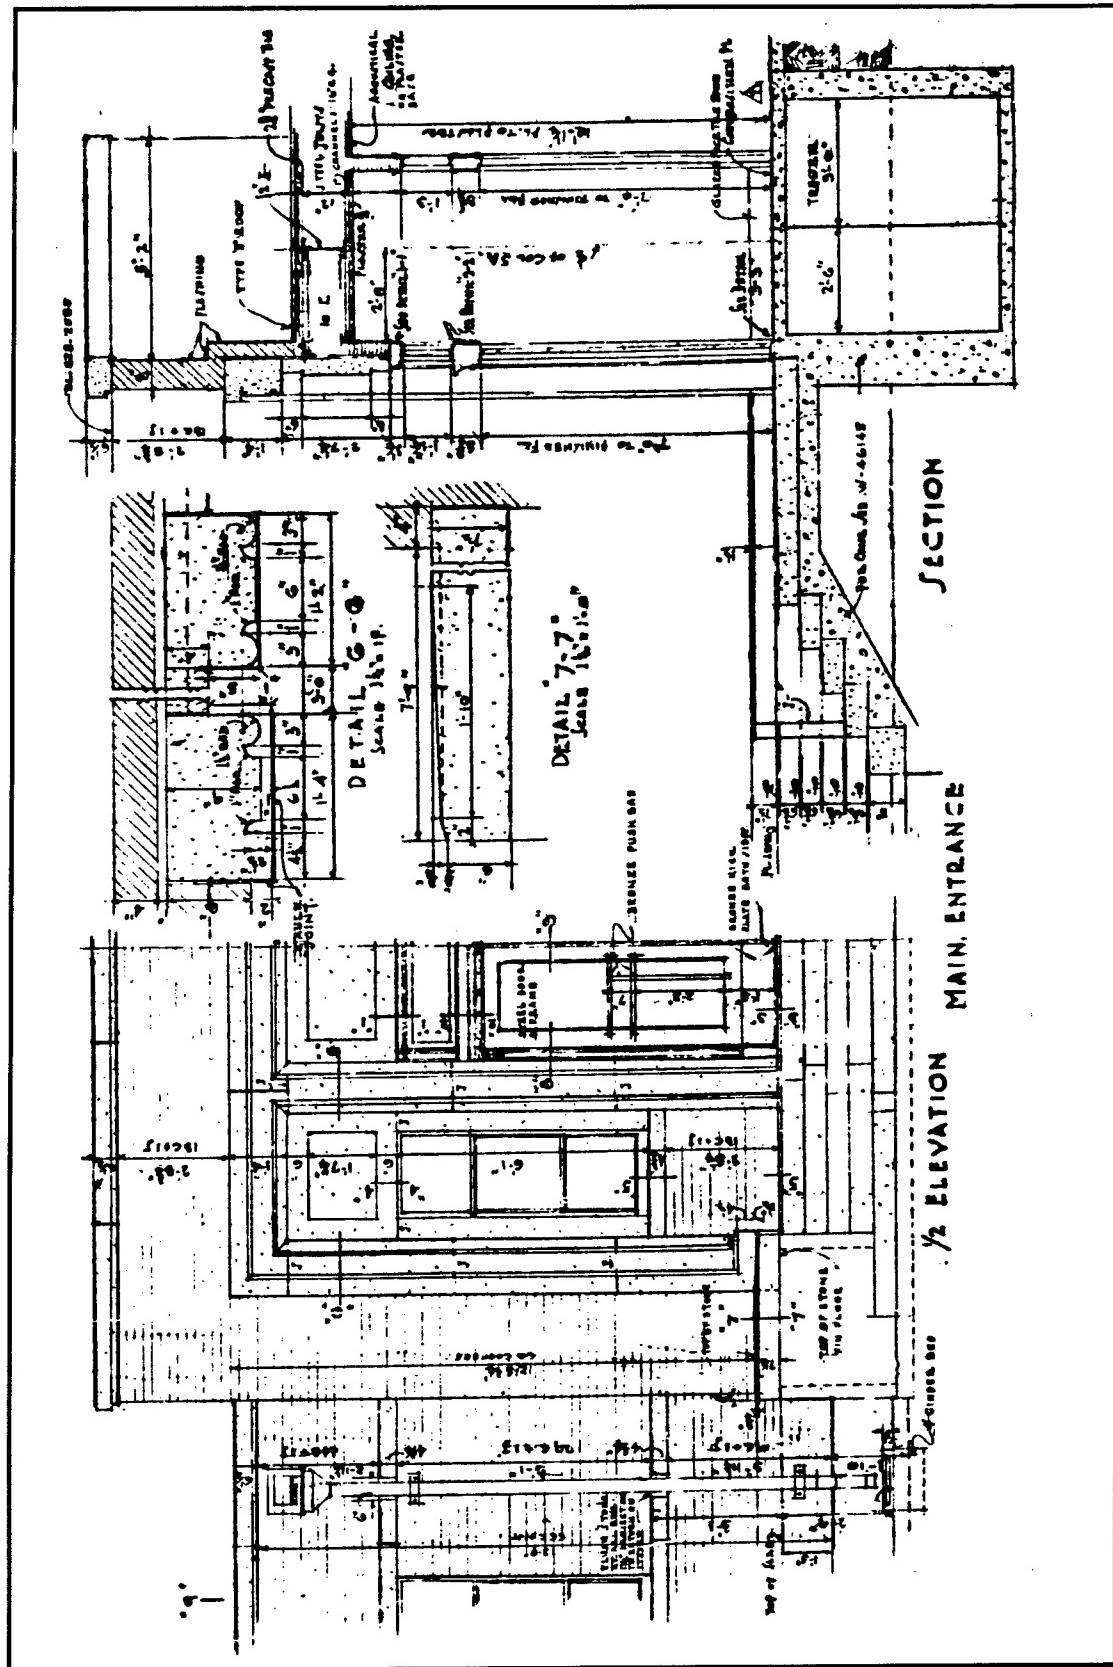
Main entrance elevation and section views, Main Cafeteria (Building 708-A), Indiana Ordnance Works Plant 1 (INAAP Drawing W-45941).
